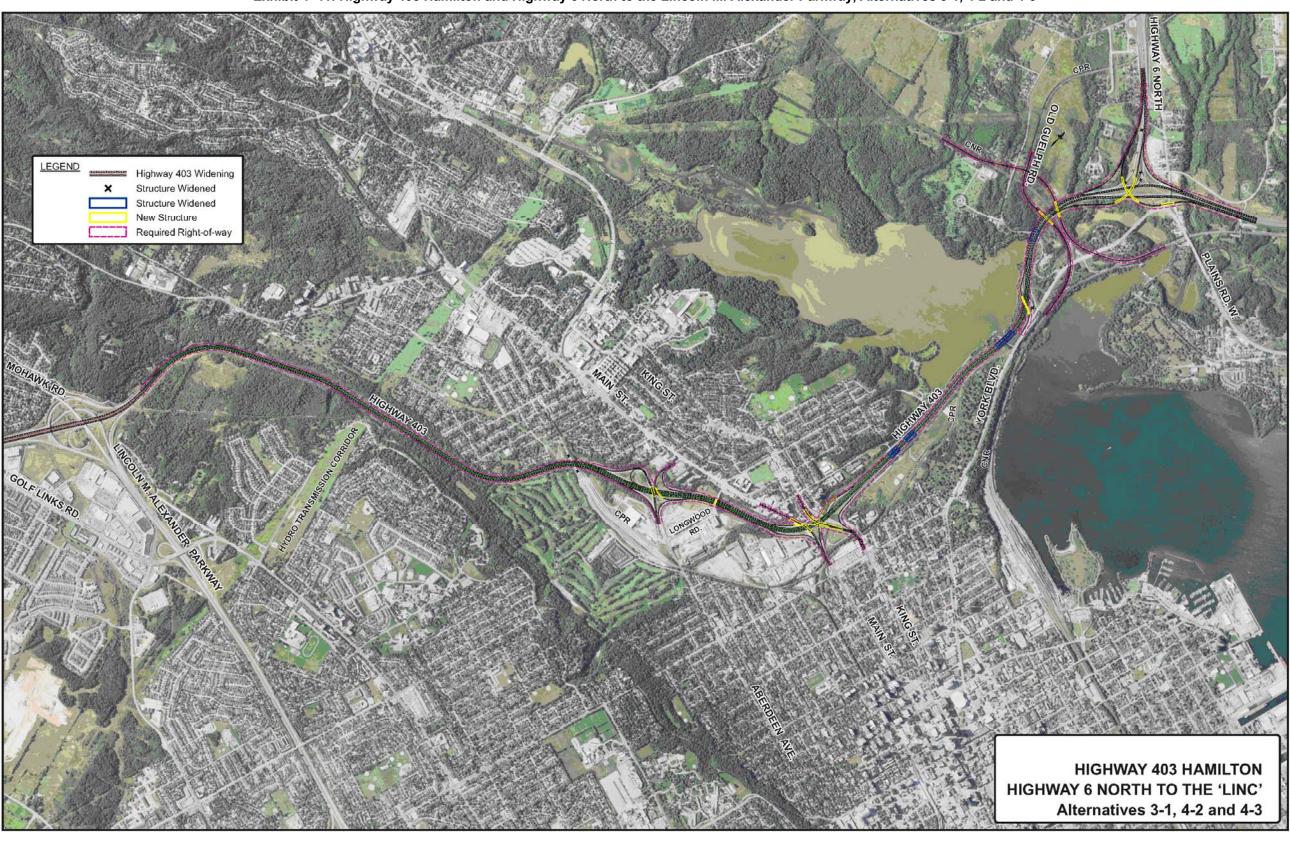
Highway 403 Hamilton and Highway 6 North to the Lincoln M. Alexander Parkway, Alternatives 3-1, 4-2 and 4-3
